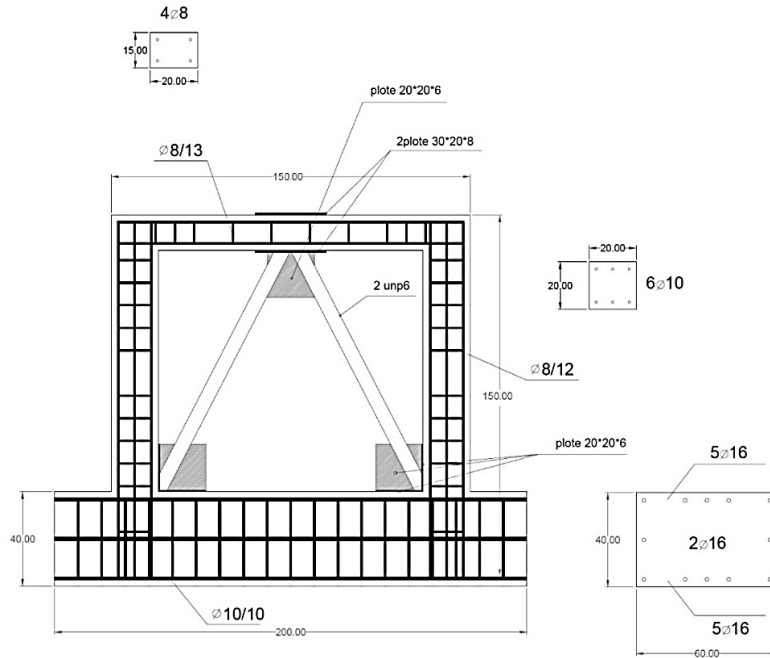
Extended plane of the subjected ADAS damper (units are in meters)
